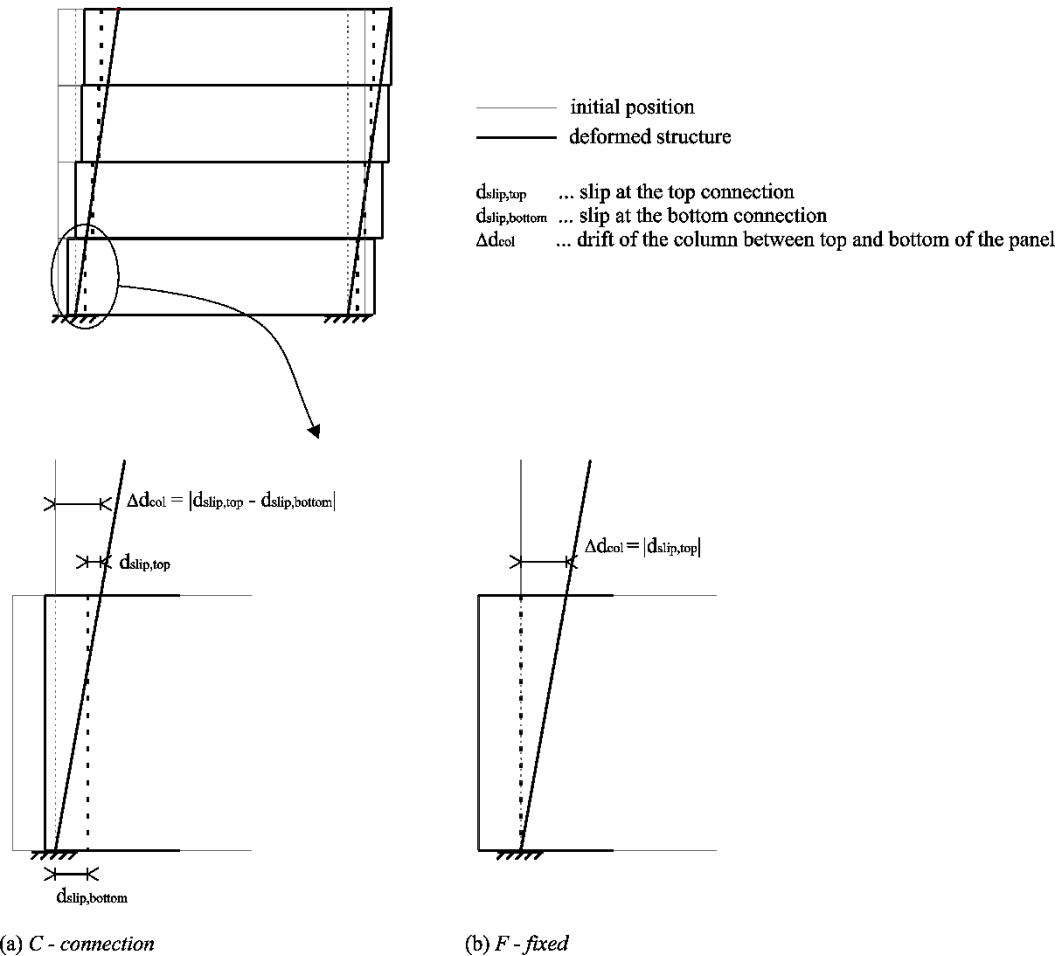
Response of the structure with horizontal cladding panels: (a) bottom panel connected to the column with cantilever connection and sealed with silicone to the foundation, (b) bottom panel fixed to the foundation
